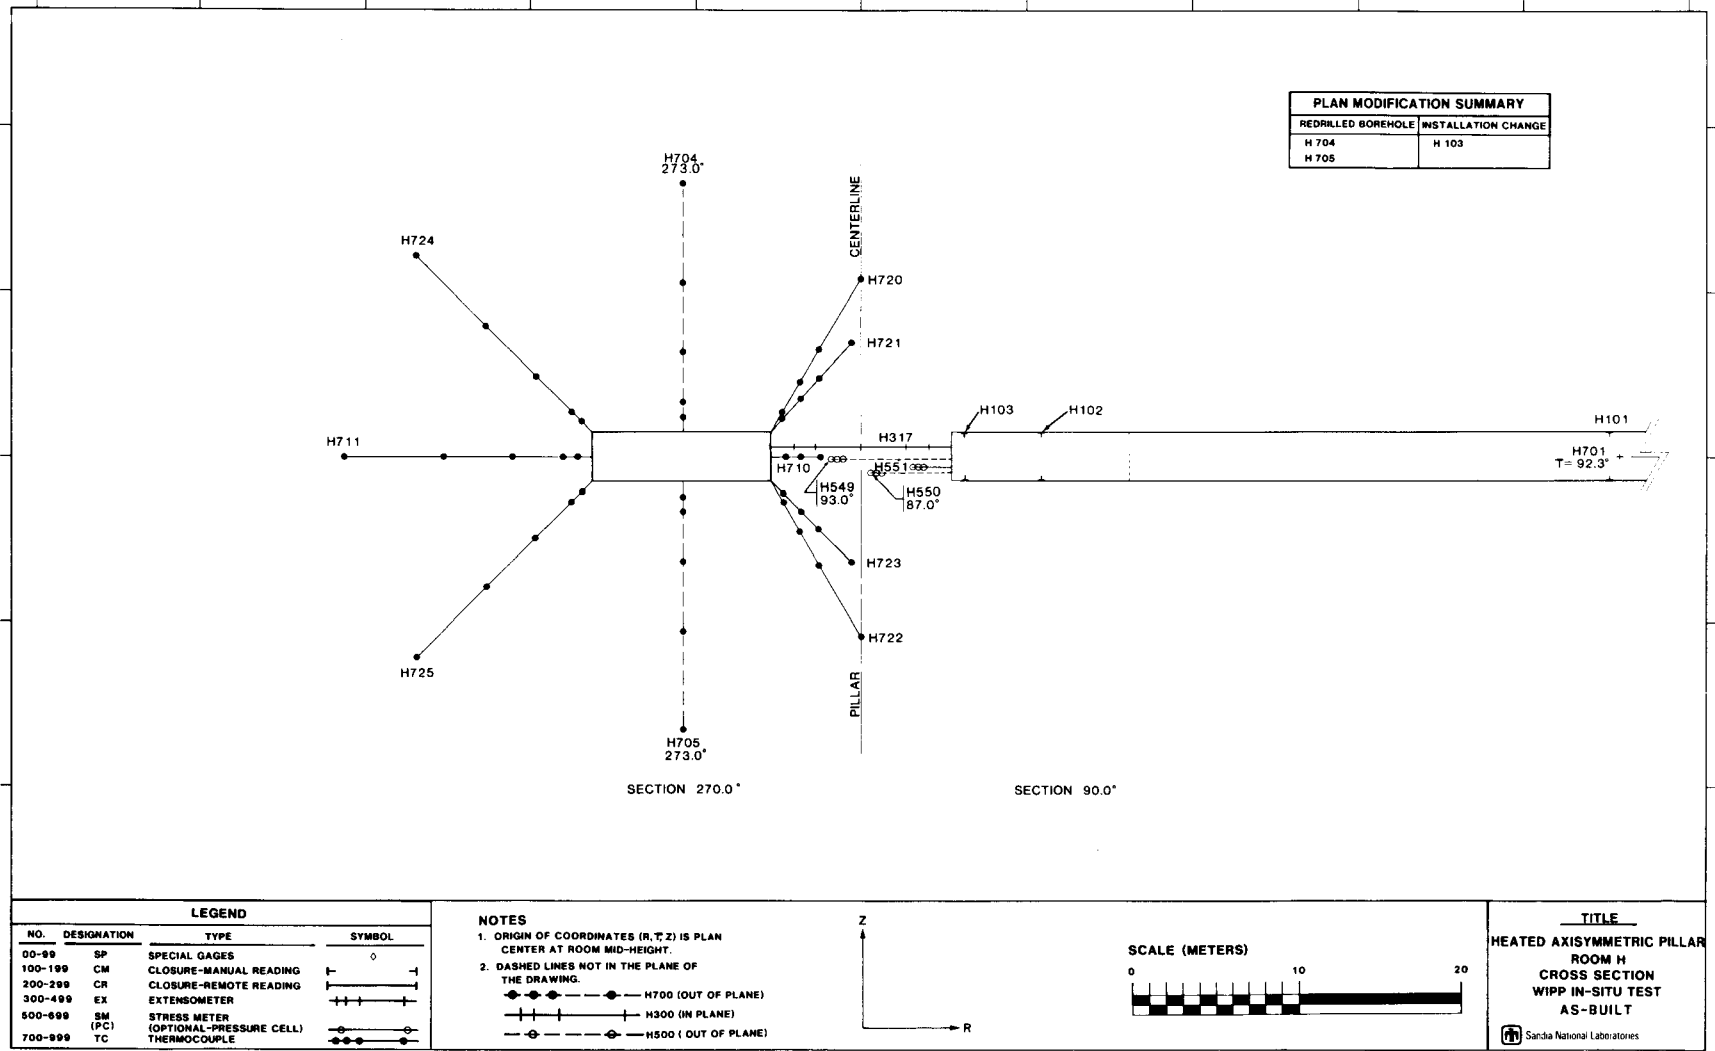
Cross Section of 90° and 270° Instrument Stations
